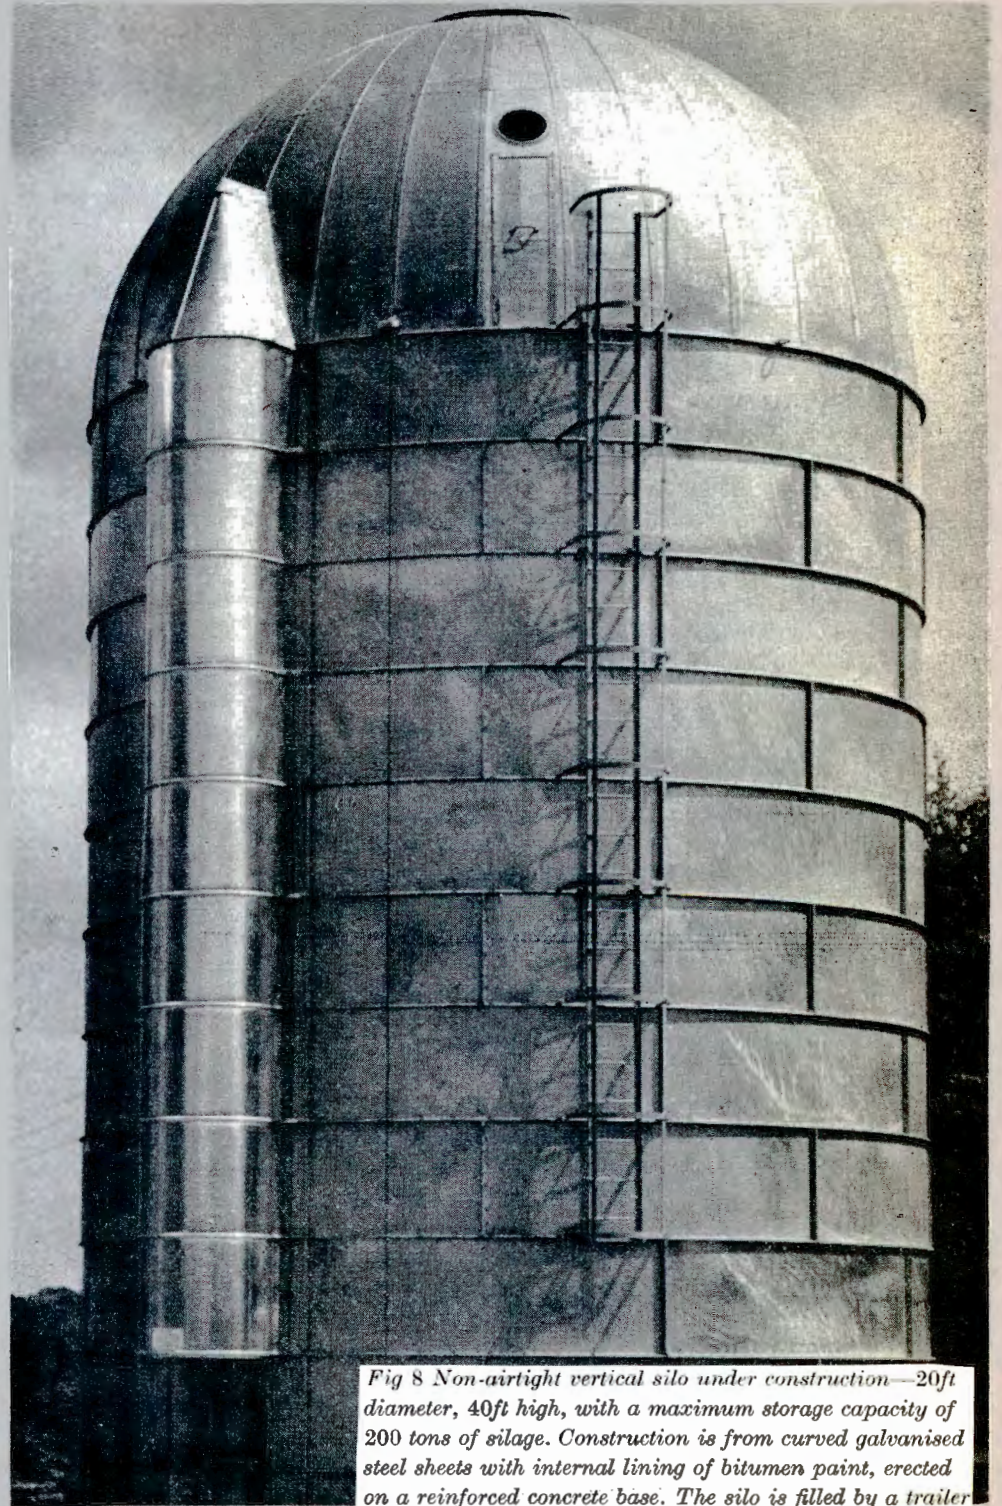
Non-airtight vertical silo under construction—20ft diameter, 40ft high, with a maximum storage capacity of 200 tons of silage. Construction is from curved galvanised steel sheets with internal lining of bitumen paint, erected on a reinforced concrete base. The silo is filled by a trailer tipping at the base from which the grass is augered into a forage blower and blown up a 9in pipe fitted into the circular hole above the trap door at the top. Emptying the silo is achieved by an internal rotating cutter, suspended from the roof, which drops the silage down the external projecting rib
